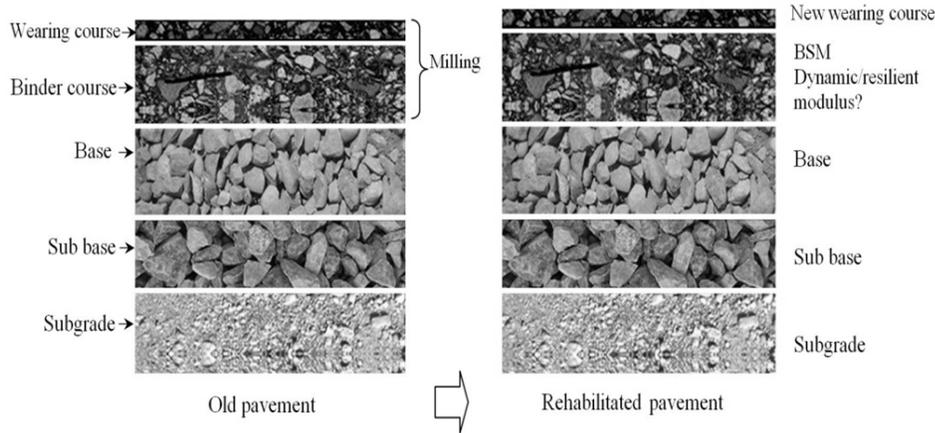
Cross section of a pavement ( M-E PDG, 2004)
